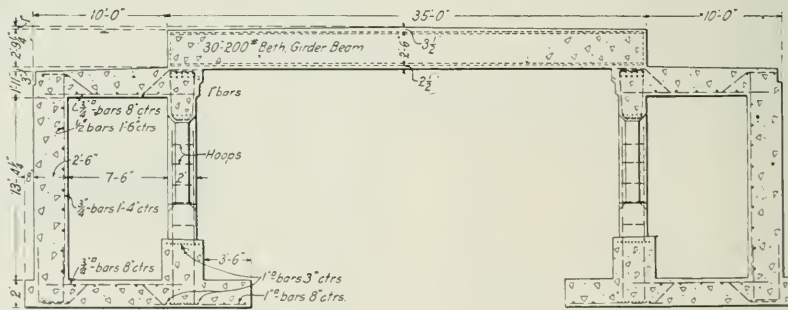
An Example of Box Abutment Construction Enclosing the Sidewalk Spans
